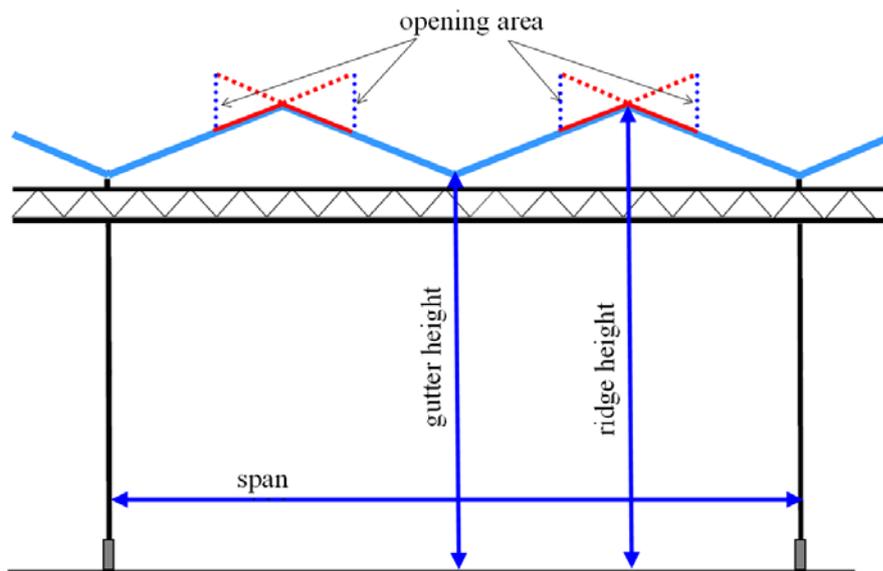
2D sketch plane of a typical Venlo type greenhouse with continuous roof openings.
